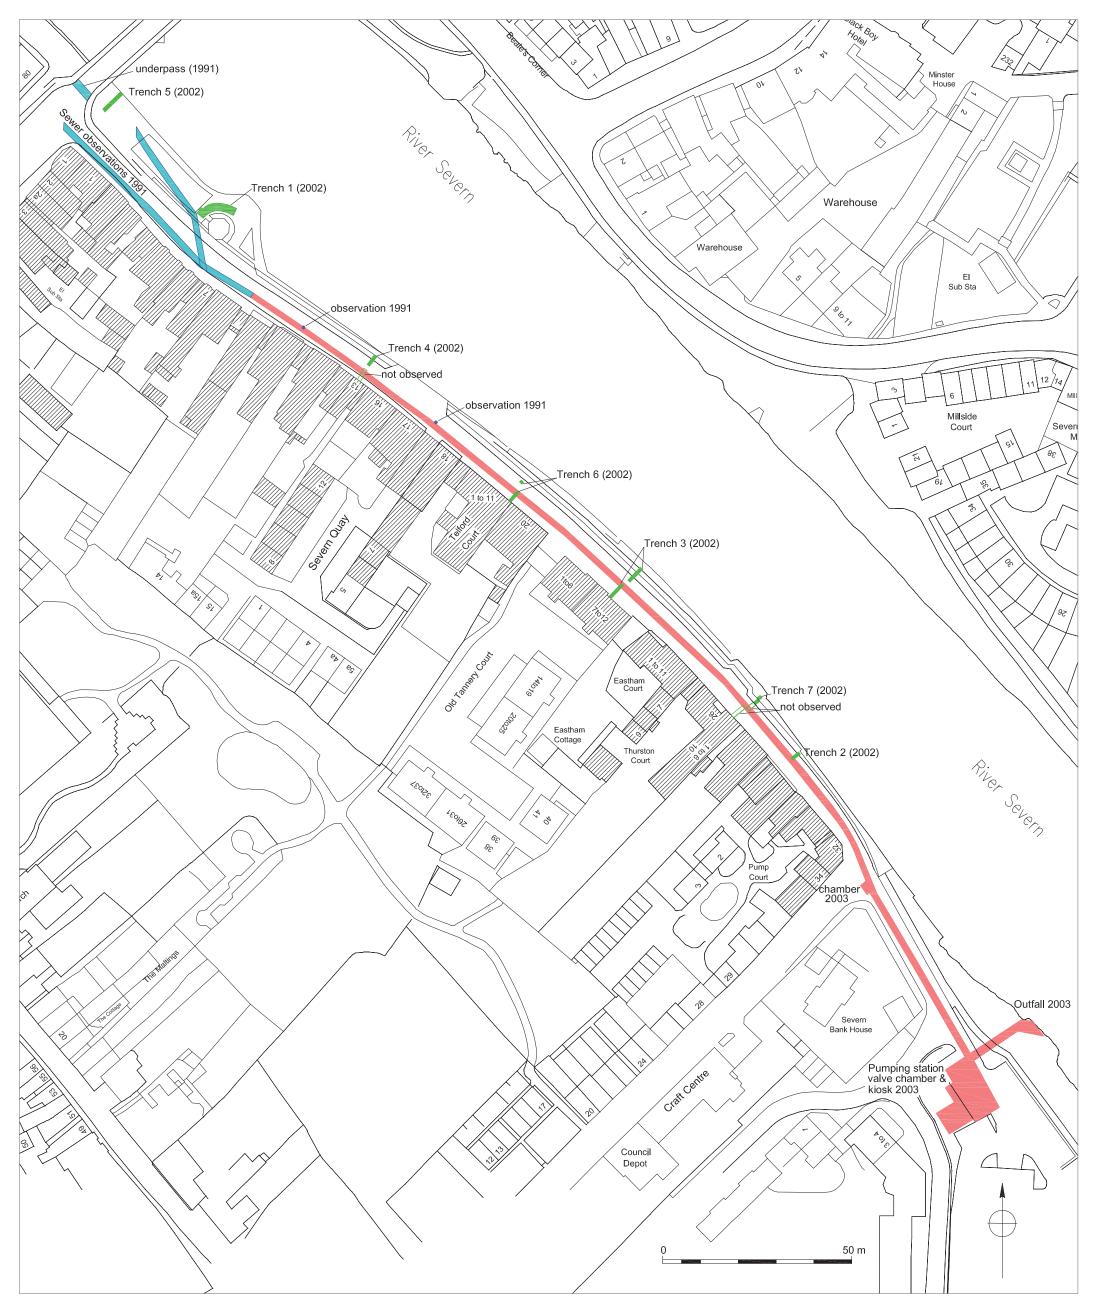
(i) Plan of groundworks - Observations 1991, 2001/3 and 2002
